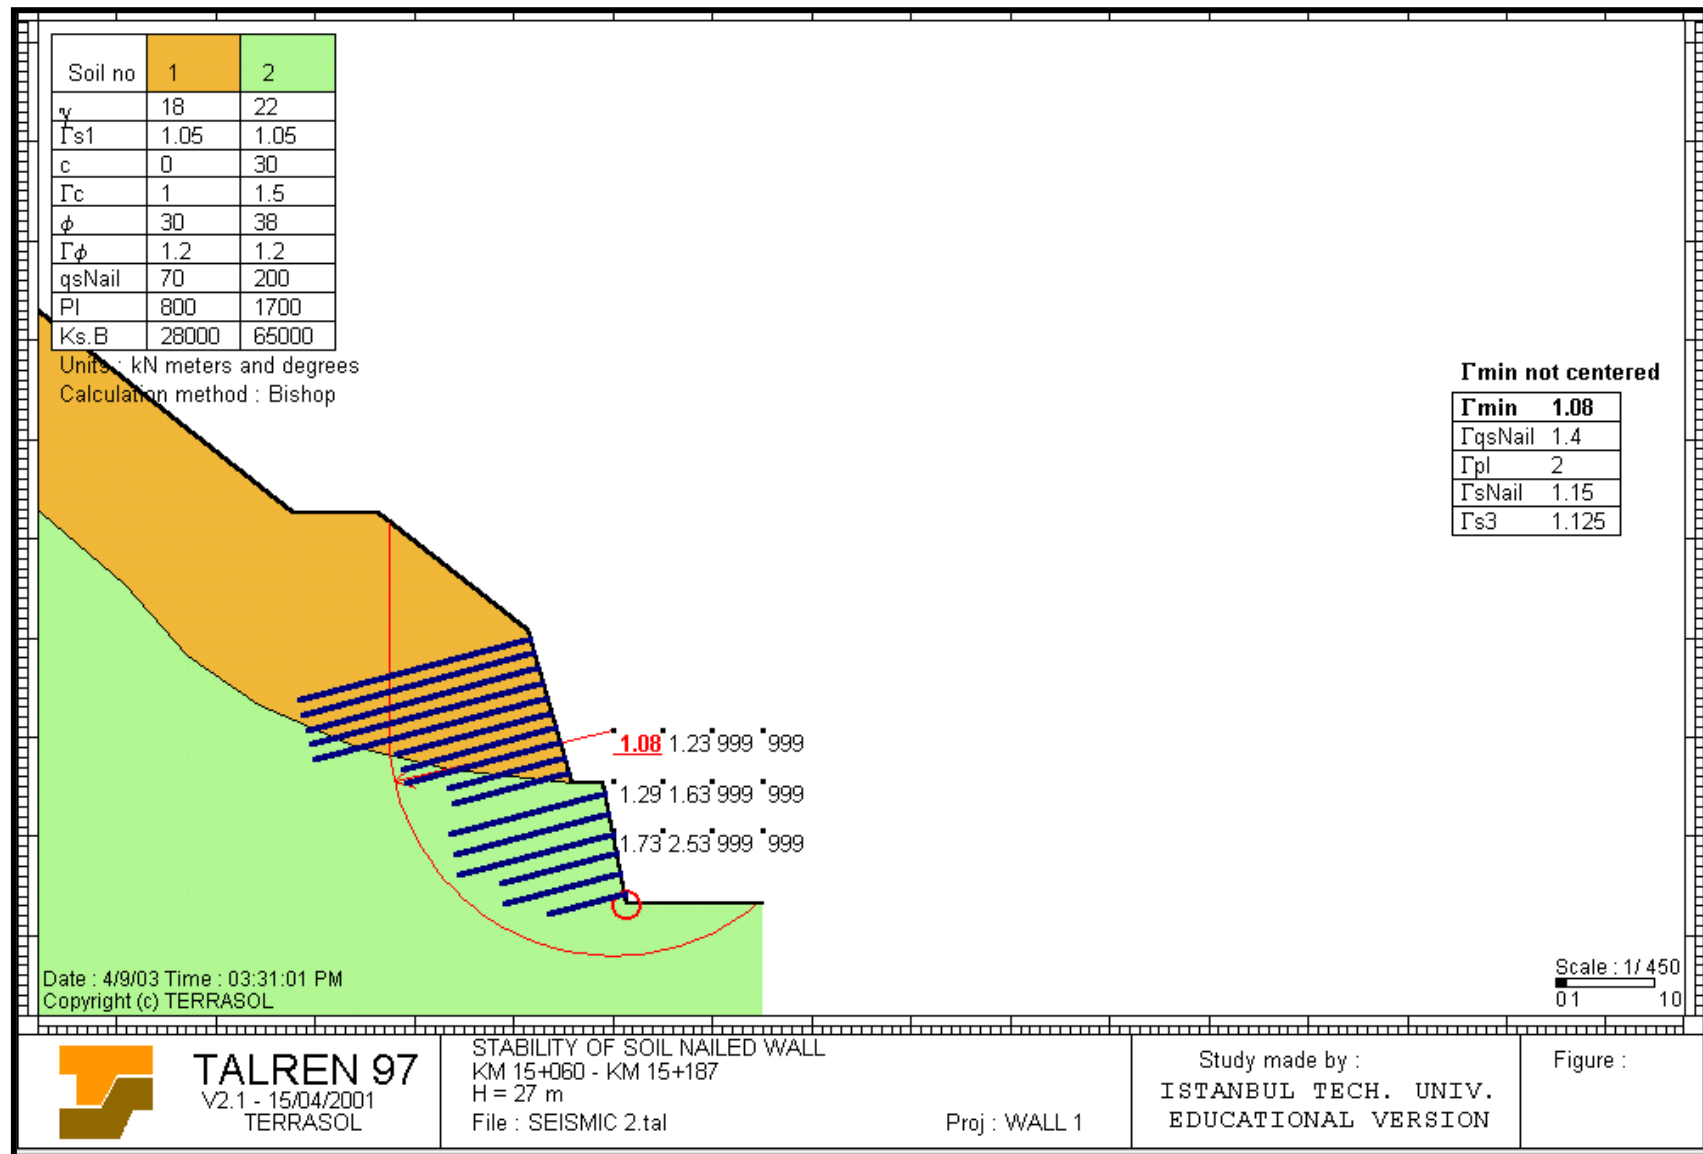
Seismic design and stability analysis of the soil nailed wall with TALREN 97 (For shallow failure surface)
